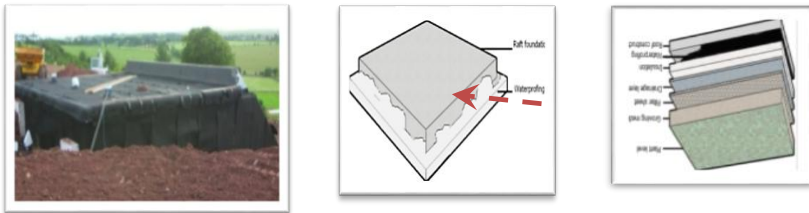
images show the insulation of waterproofing and its layers used in roof and floor.
